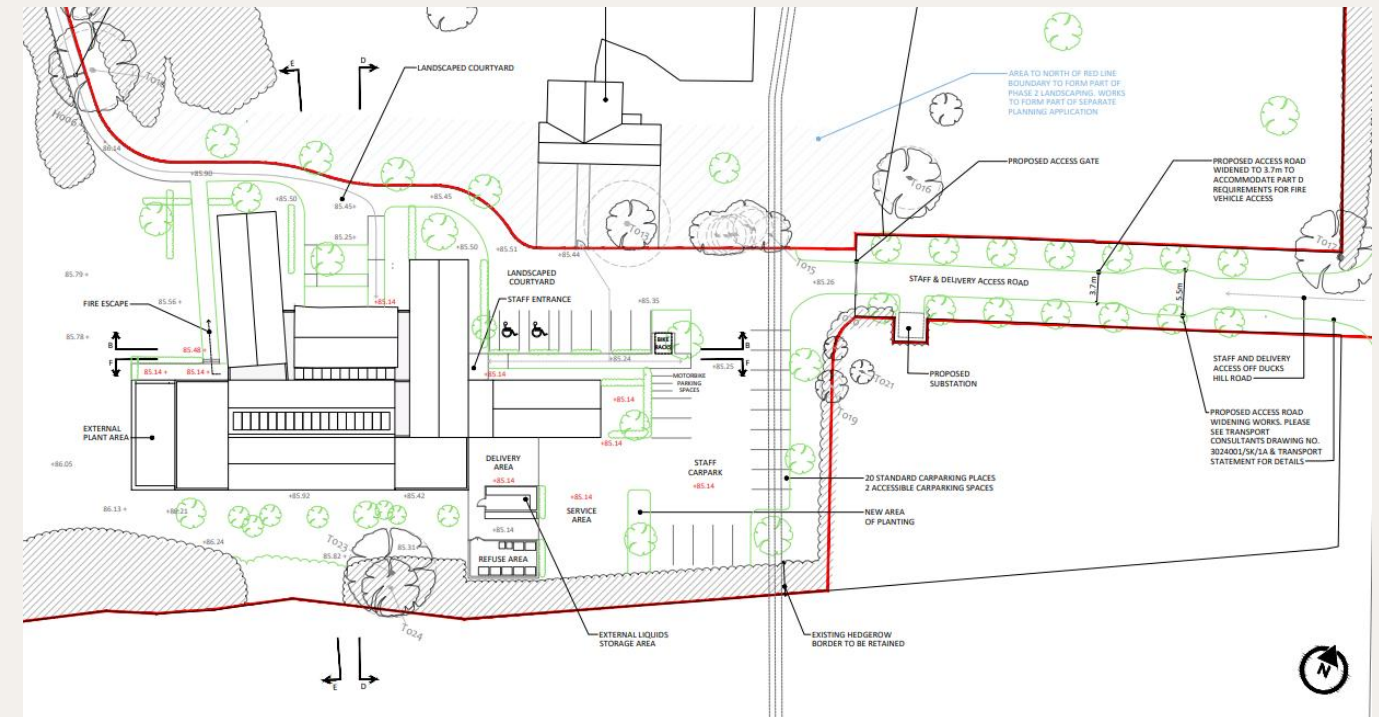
Proposed Site Plan General Arrangement (Source: McDonald Architects)
